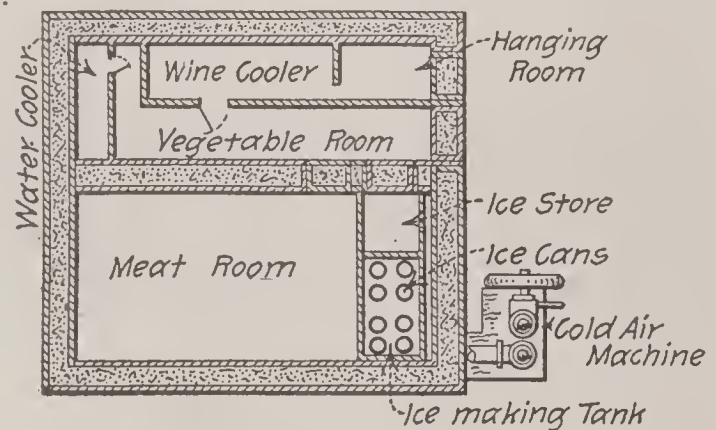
ARRANGEMENT OF REFRIGERATING PLANT ON LARGE PASSENGER STEAMER.
